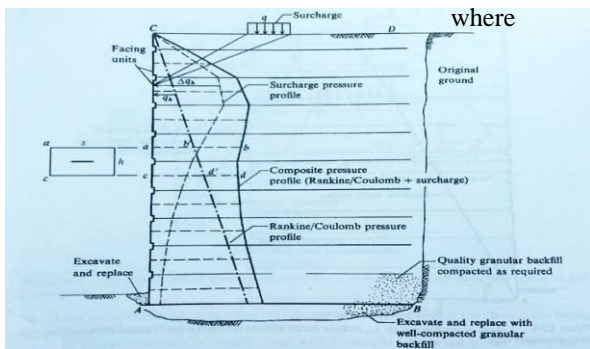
; General wall case with surcharge on backfill as from a road or other construction.
